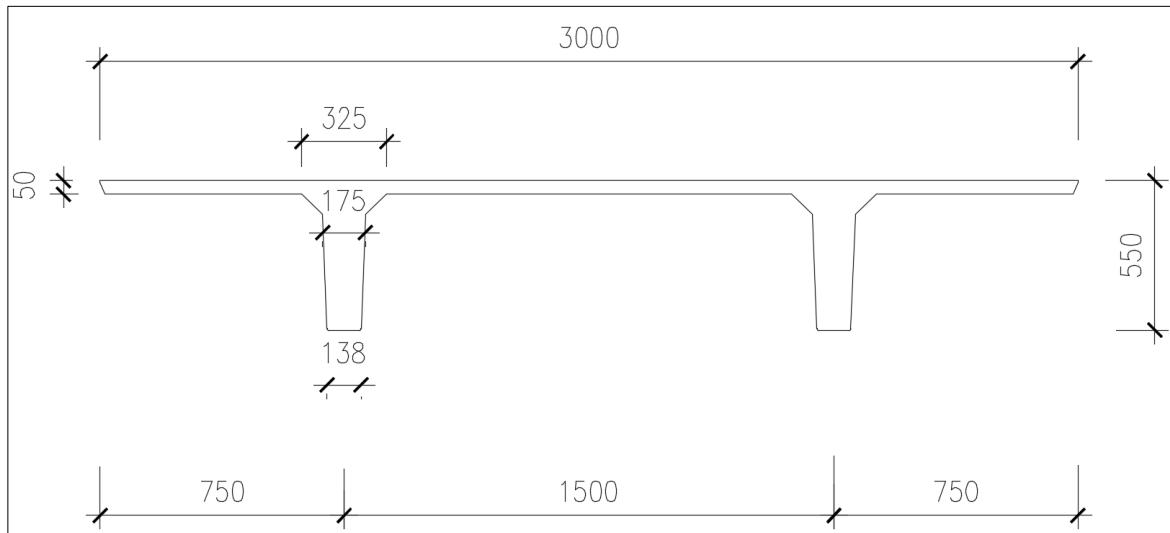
Proposed Cross Sectional Geometry for Partially Precast Standard DT for floor slabs of office buildings for Indian Markets (all dimensions in mm)
